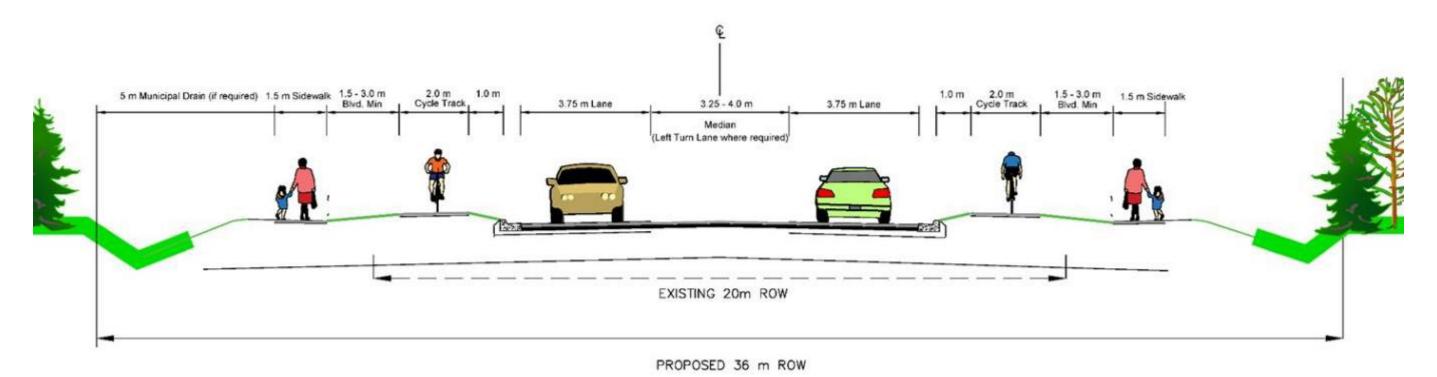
Concession Roads 8 and 9 – Alternative 4 – 3-Lane Urban Cross Section with Cycle Tracks and Sidewalks
